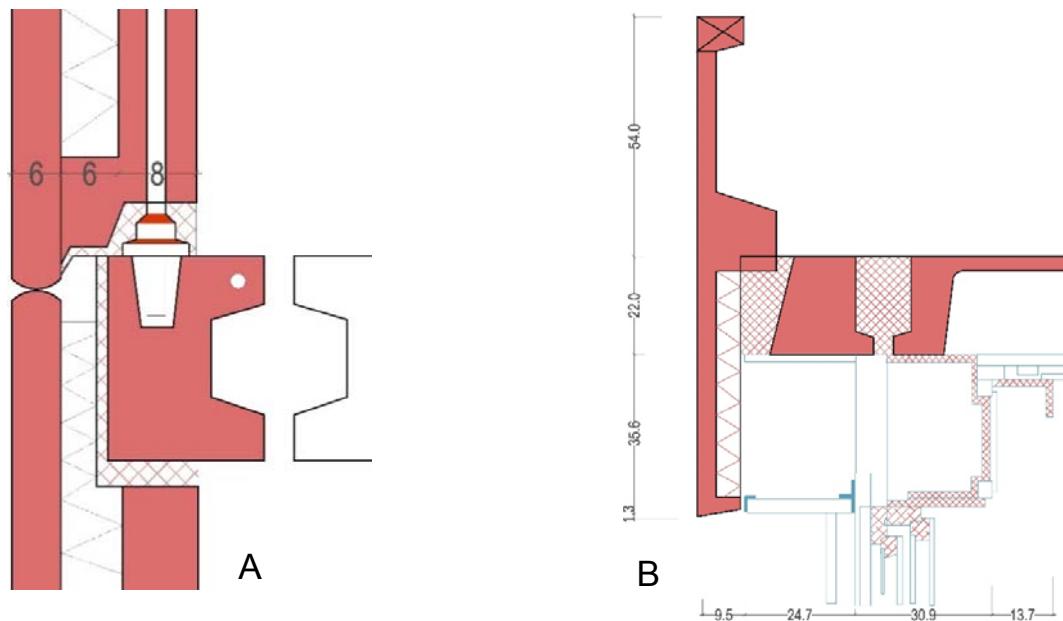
Facade cladding system: (a) Connections with roof slab (b) Joint between floor slab and parapet panel (Rahman, SMM 2018). Adopted from [3]
